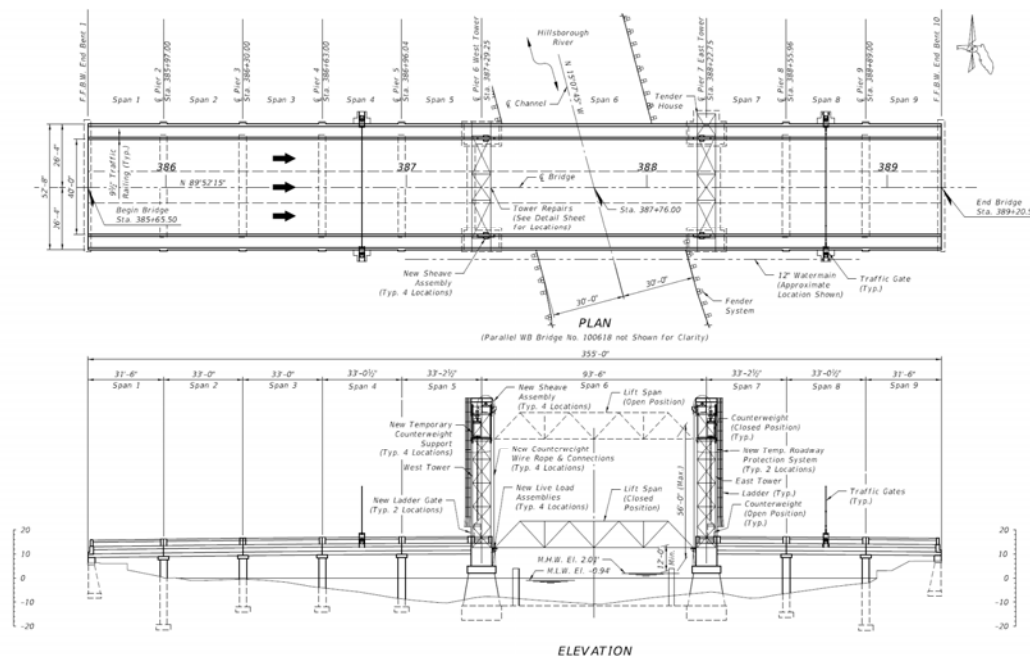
Hillsborough Vertical Lift Plan and Elevation
